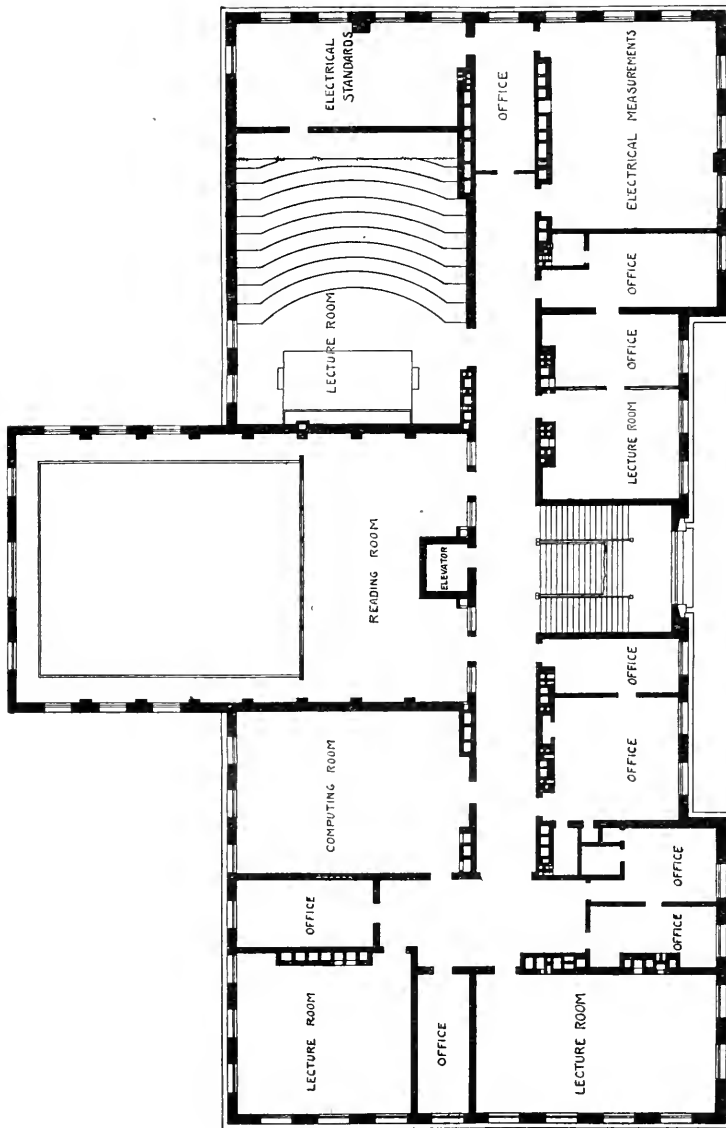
FIRST FLOOR PLAN OF THE R. E. OLDS HALL OF ENGINEERING.
